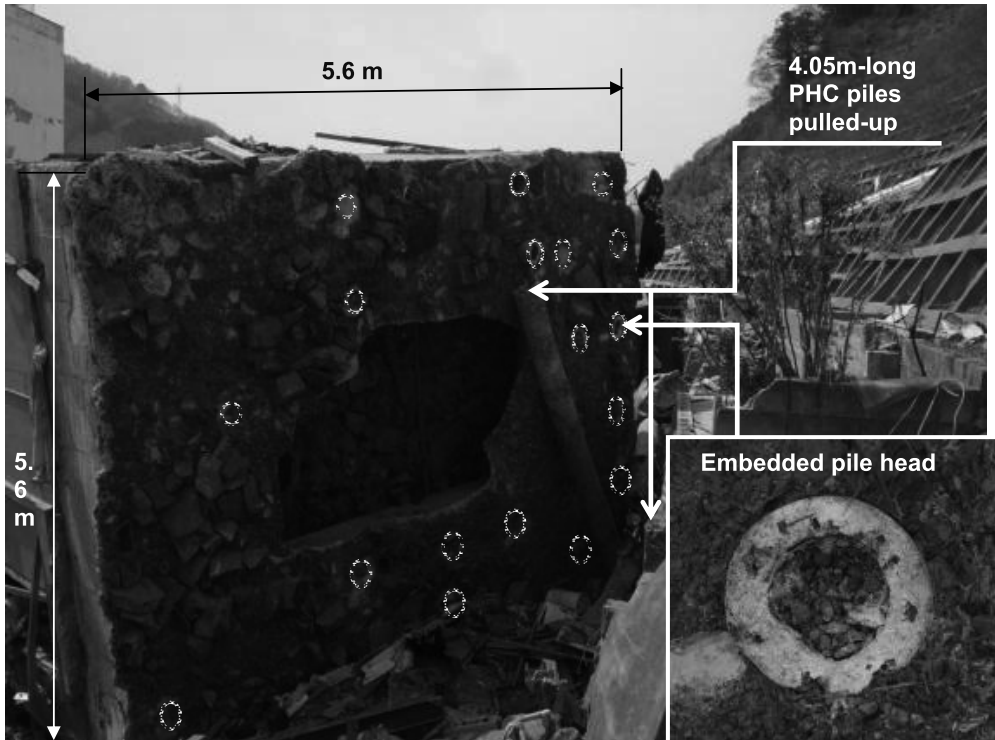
Bottom of foundation for Building #1 and piles left half-embedded in soil
